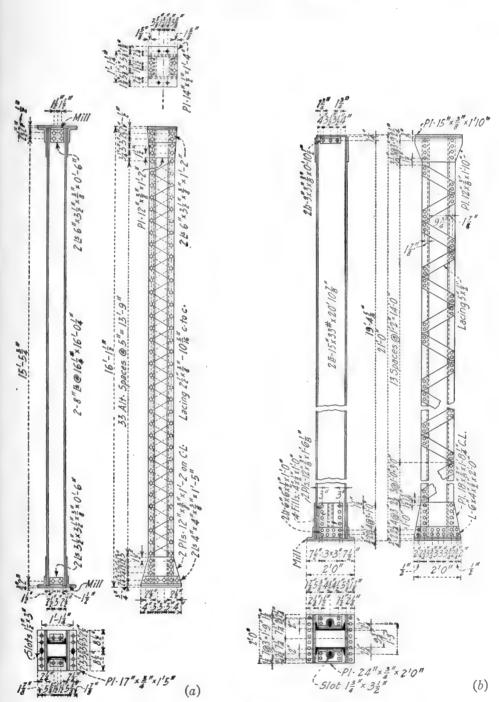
DETAILS OF MILL BUILDING COLUMNS.
